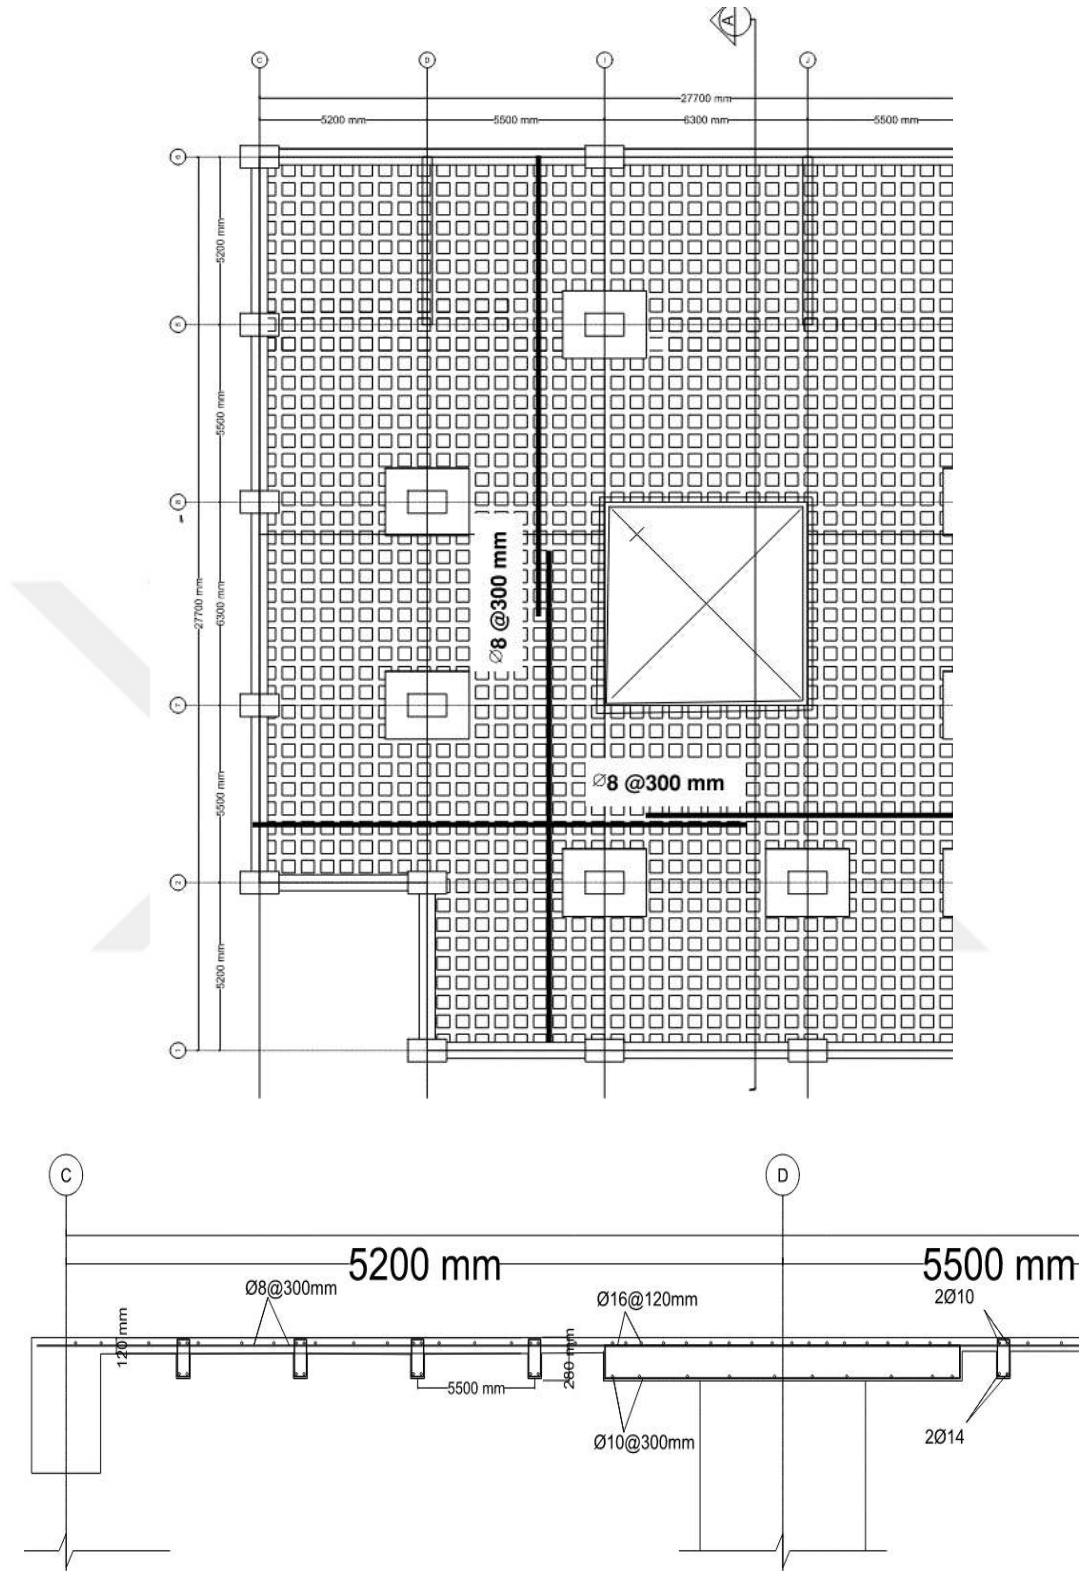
Steel Reinforcement details for Waffle Floor System Case Model (6.3-5.5-5.2).
